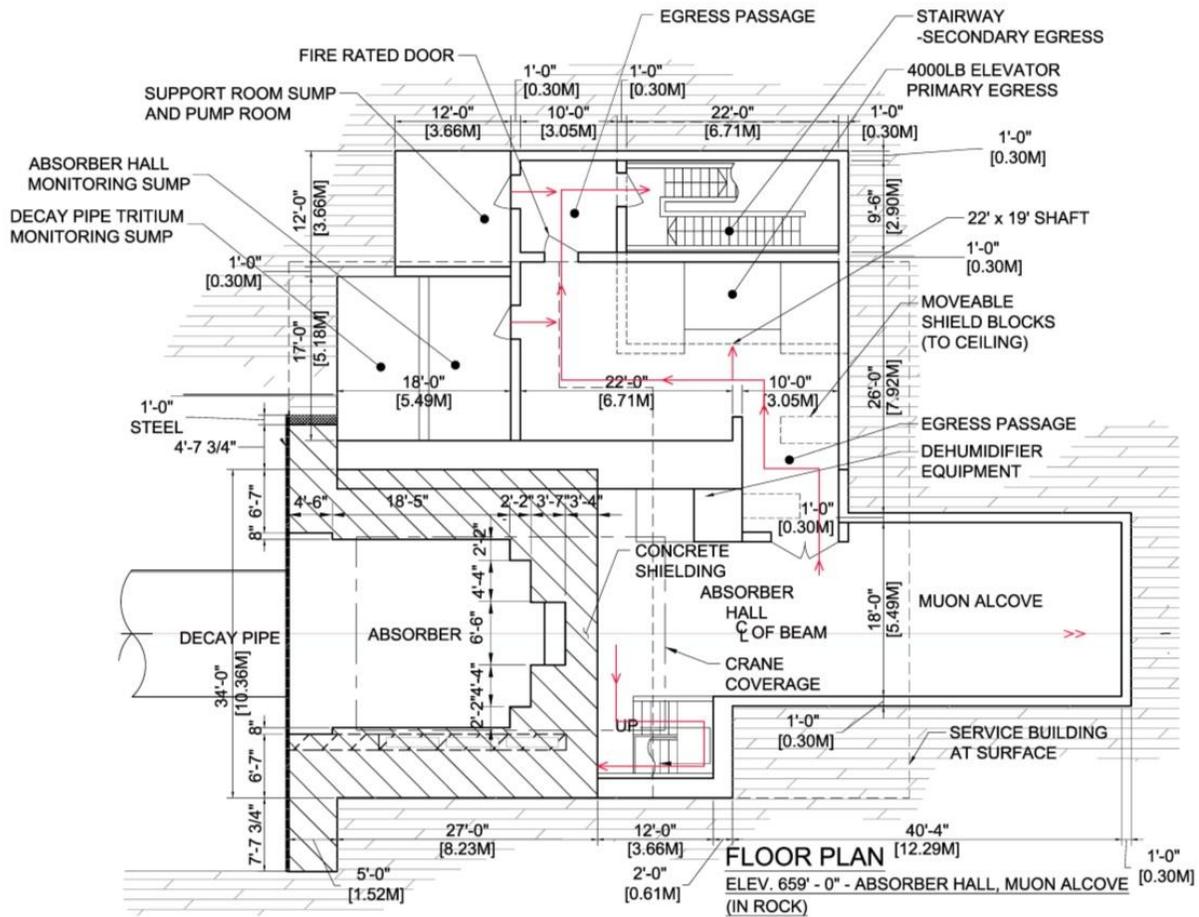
Absorber Hall, Muon Alcove, and support rooms: Upper Level, egress routing.
